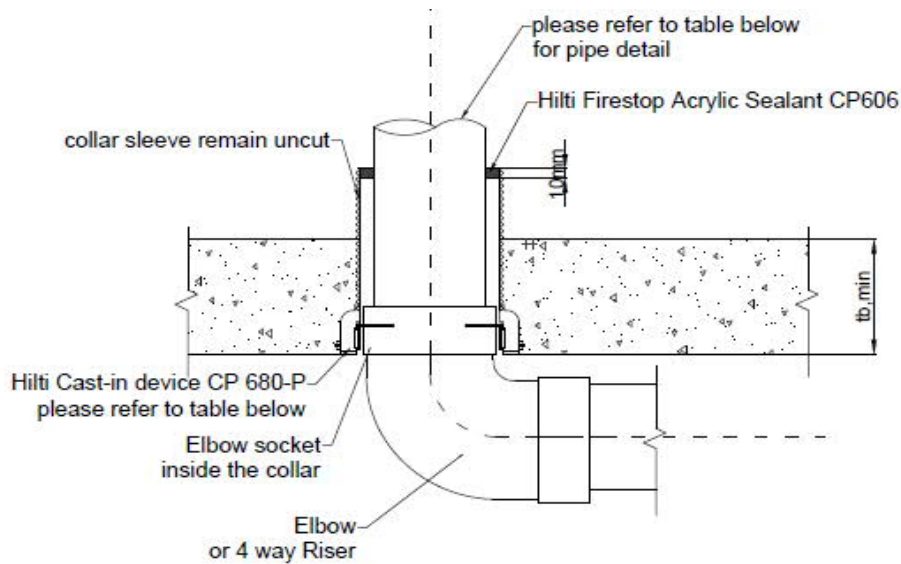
HDPE pipe with elbow inside with sleeve uncut
